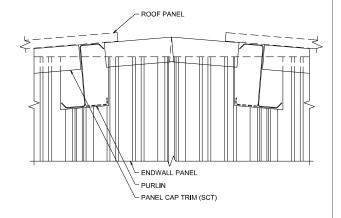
DETAIL AT EXTENSION BEAM OF UNSOFFITED EAVE EXTENSION
